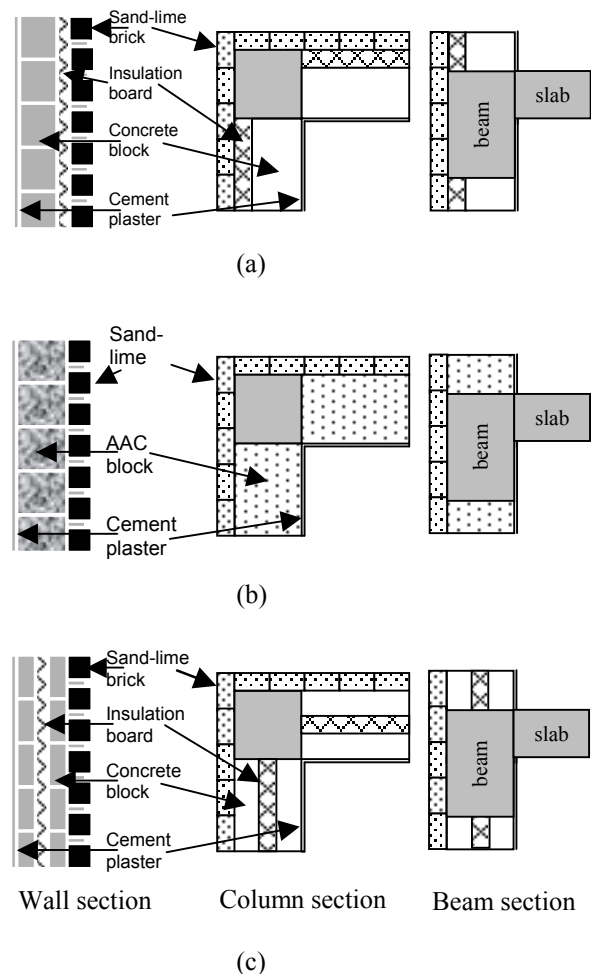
Typical construction types used in Kuwait; (a) Classical type. (b) AAC type. (c) Sandwich type.
